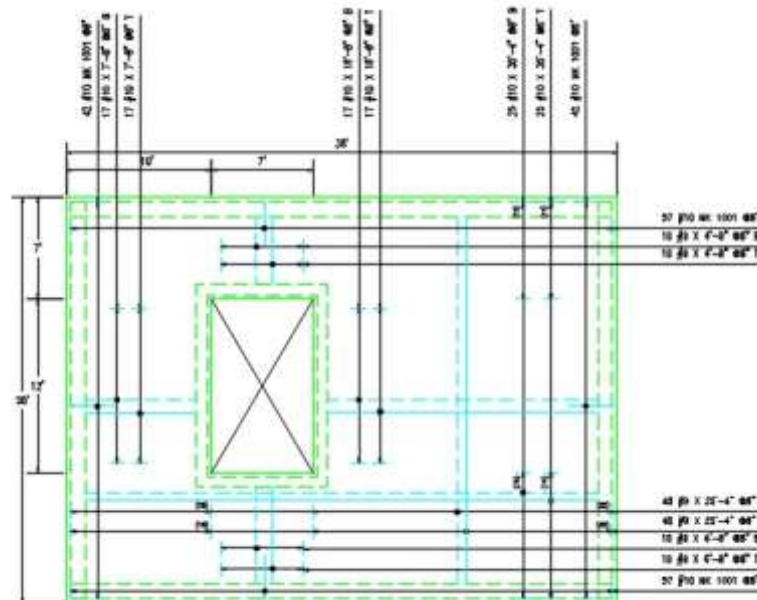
Reinforcement drawing showing top, bottom and side Steel
